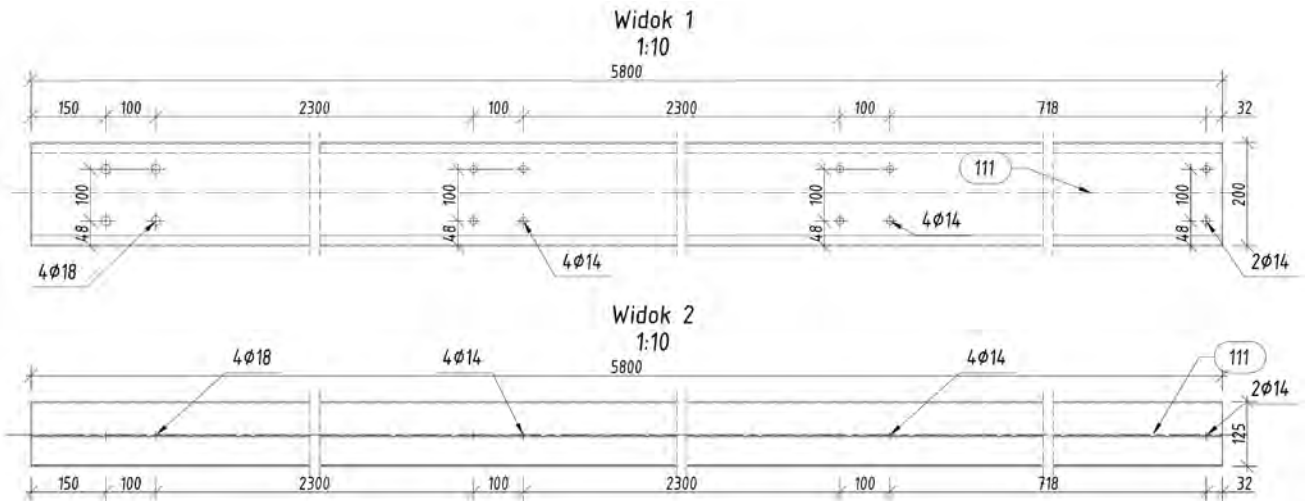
Workshop drawing of the executive-bolt main hall [8]
